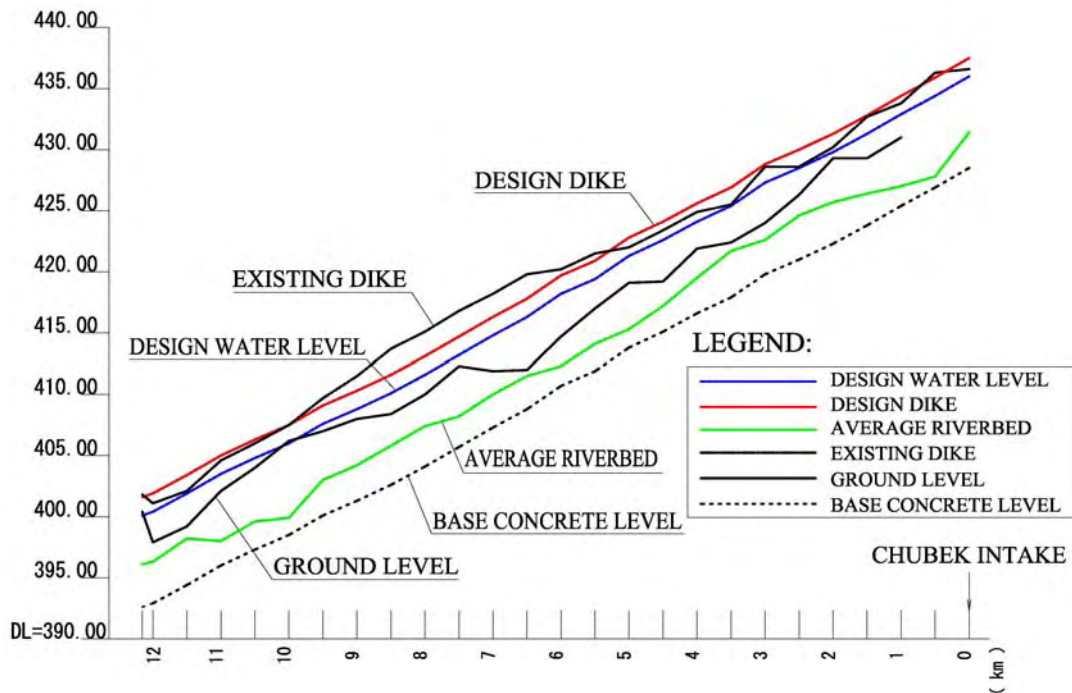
Longitudinal Cross-Section of Dike and Design Water Level
